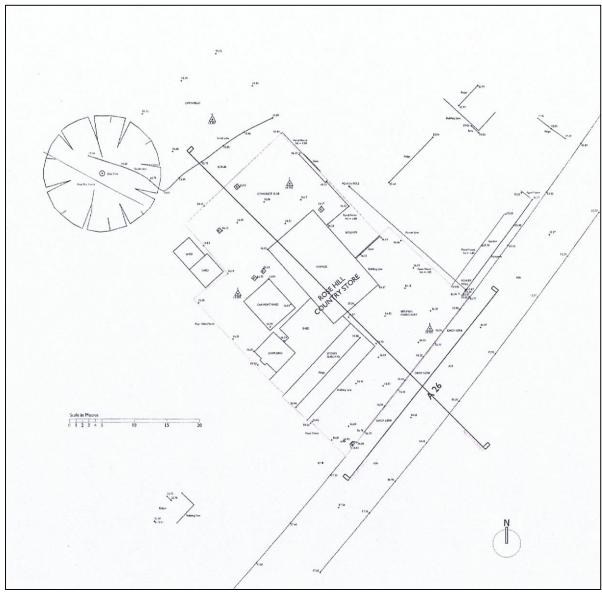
Rosehill Country Store: Site Plan prior to demolition. (Adapted from architects drawing)
